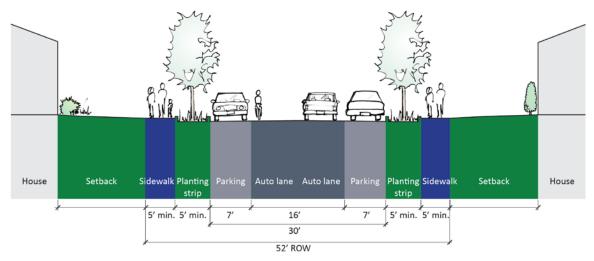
(4). Diagrammatic street sections for local access and residential streets.
